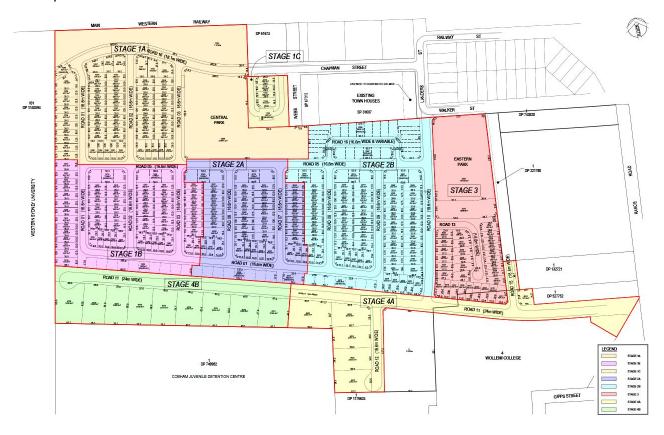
Extract from the subdivision plan currently under assessment showing staging of roads
